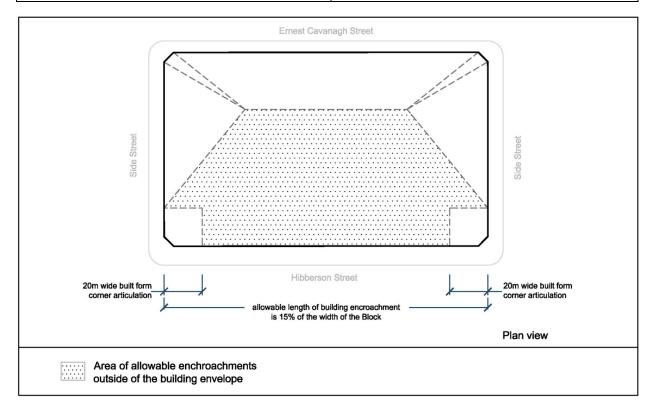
Building envelope in Precinct 1a (south side of Hibberson Street)
